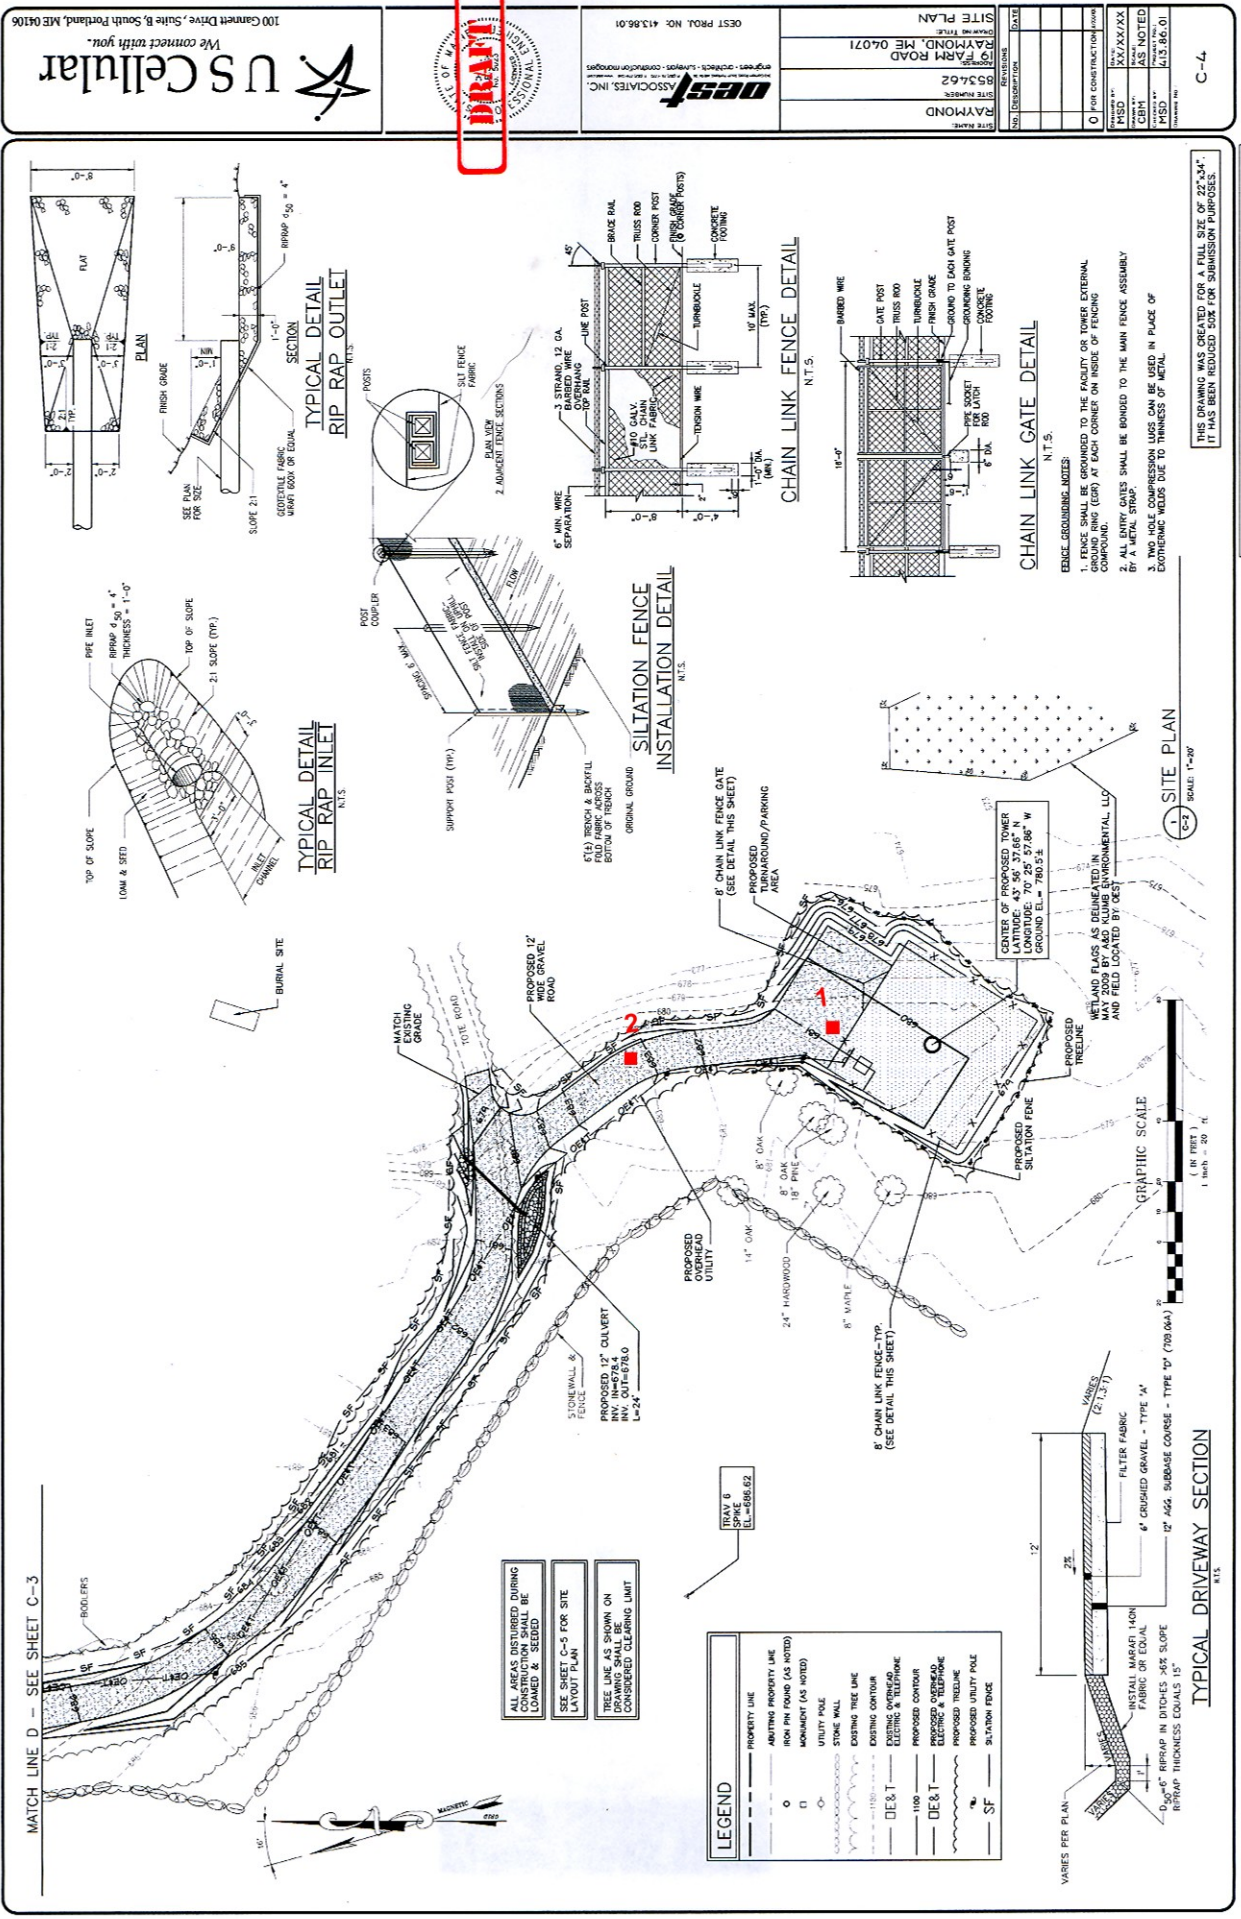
Plan of archaeological shovel test pits excavated at the project area.
